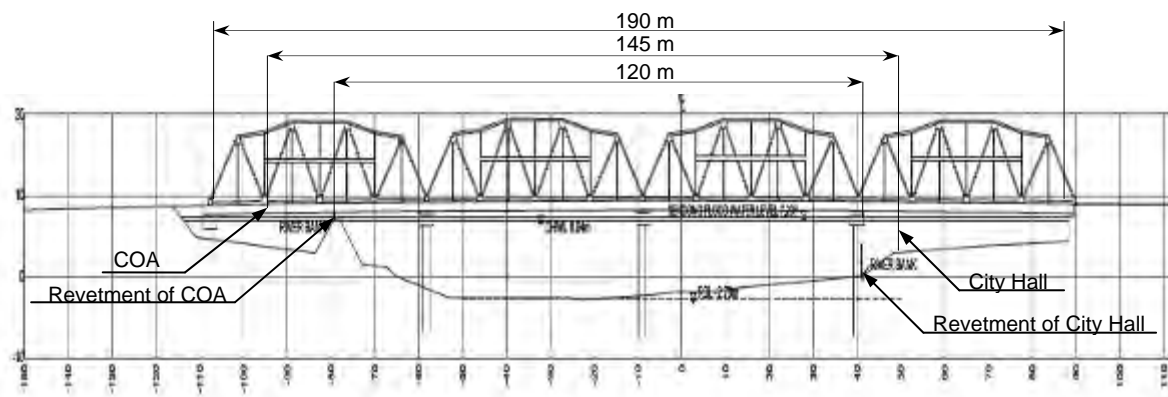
Cross Section of Bottleneck Section at Ysalina Bridge
